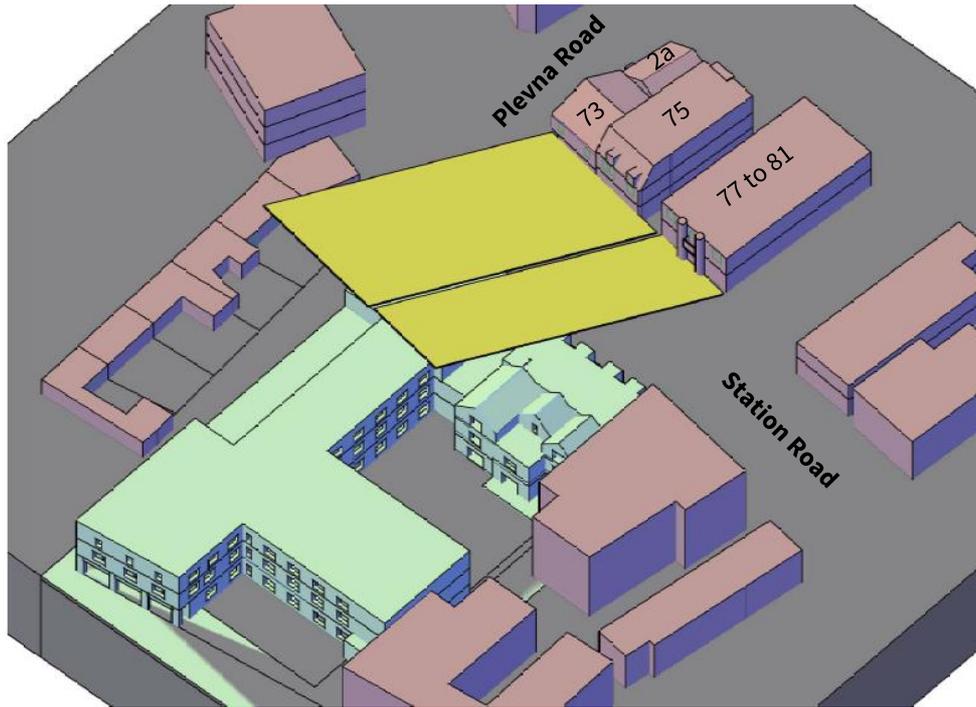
25-degree plan test view of the existing properties opposite to the site.
